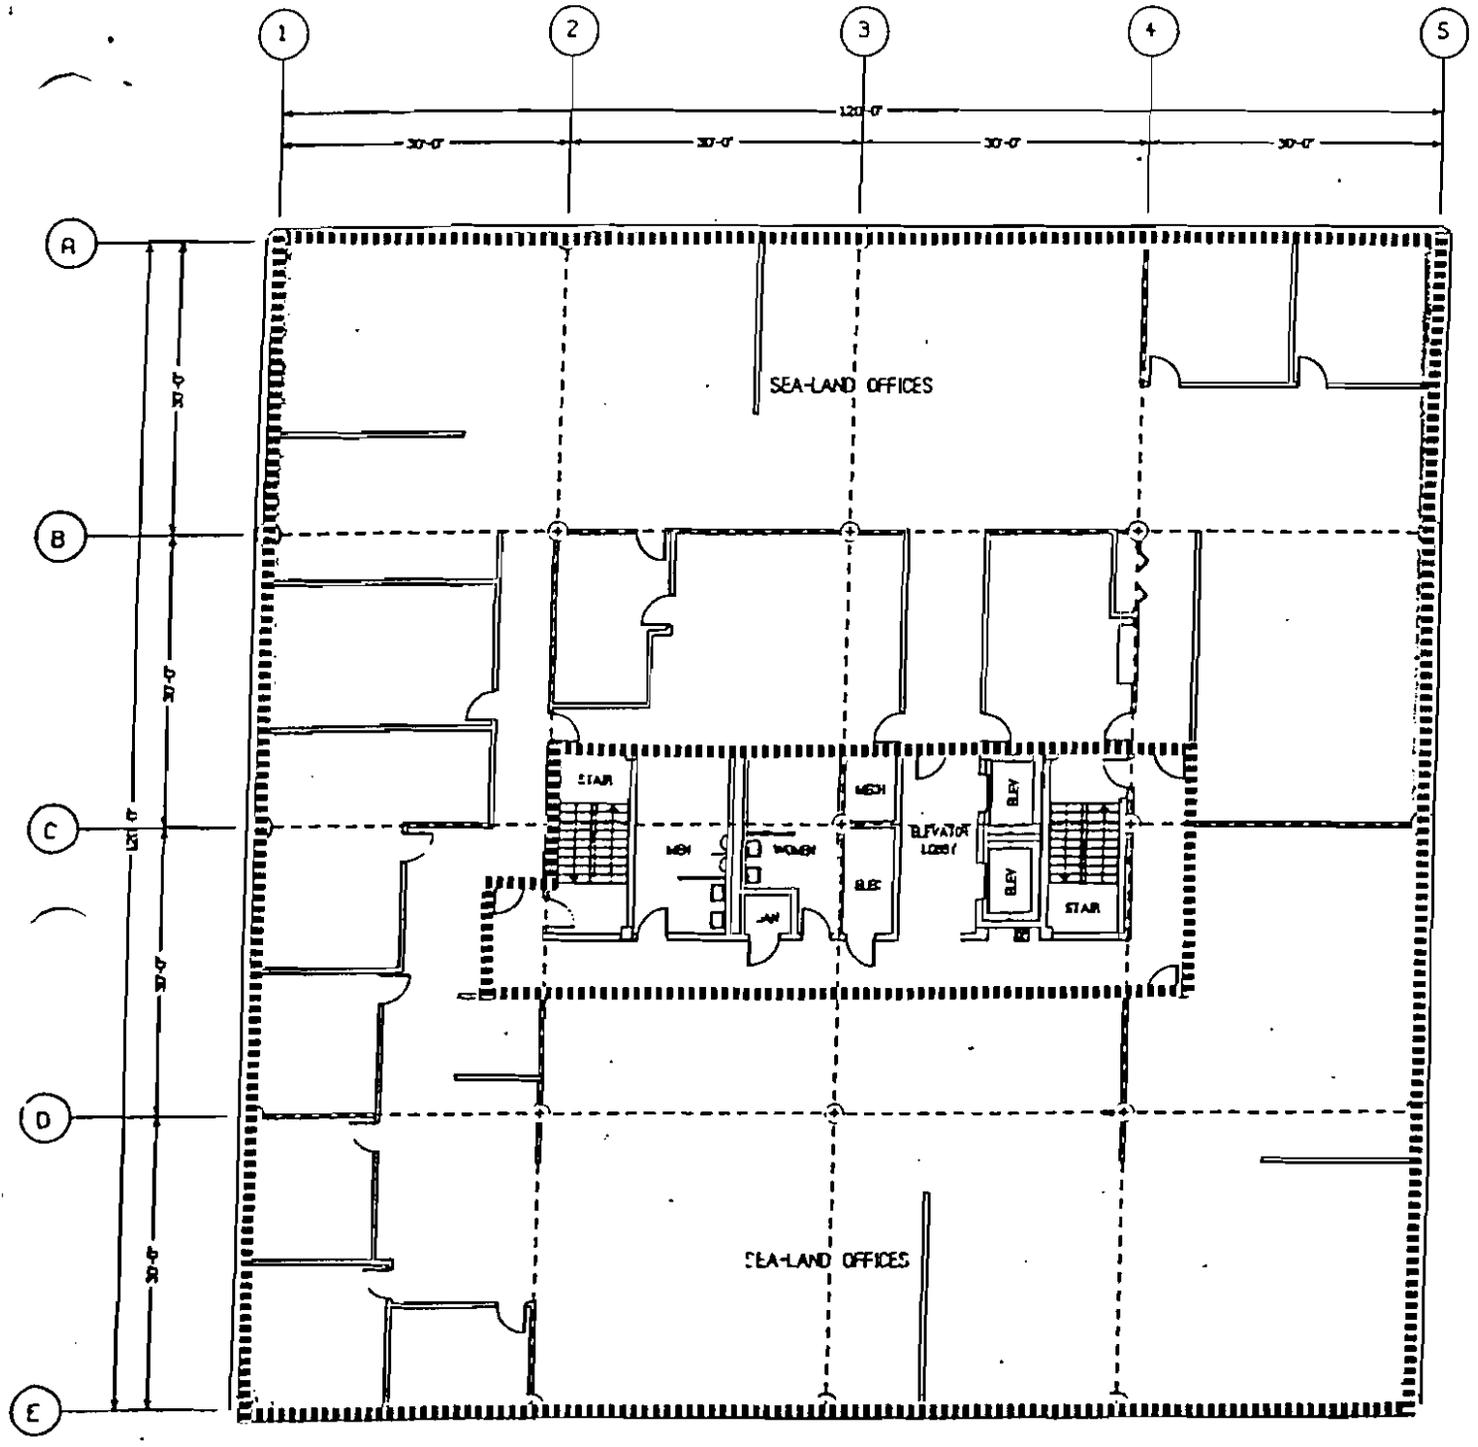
EXHIBIT "A" (Page 1): World Trade Center - 4th Floor
